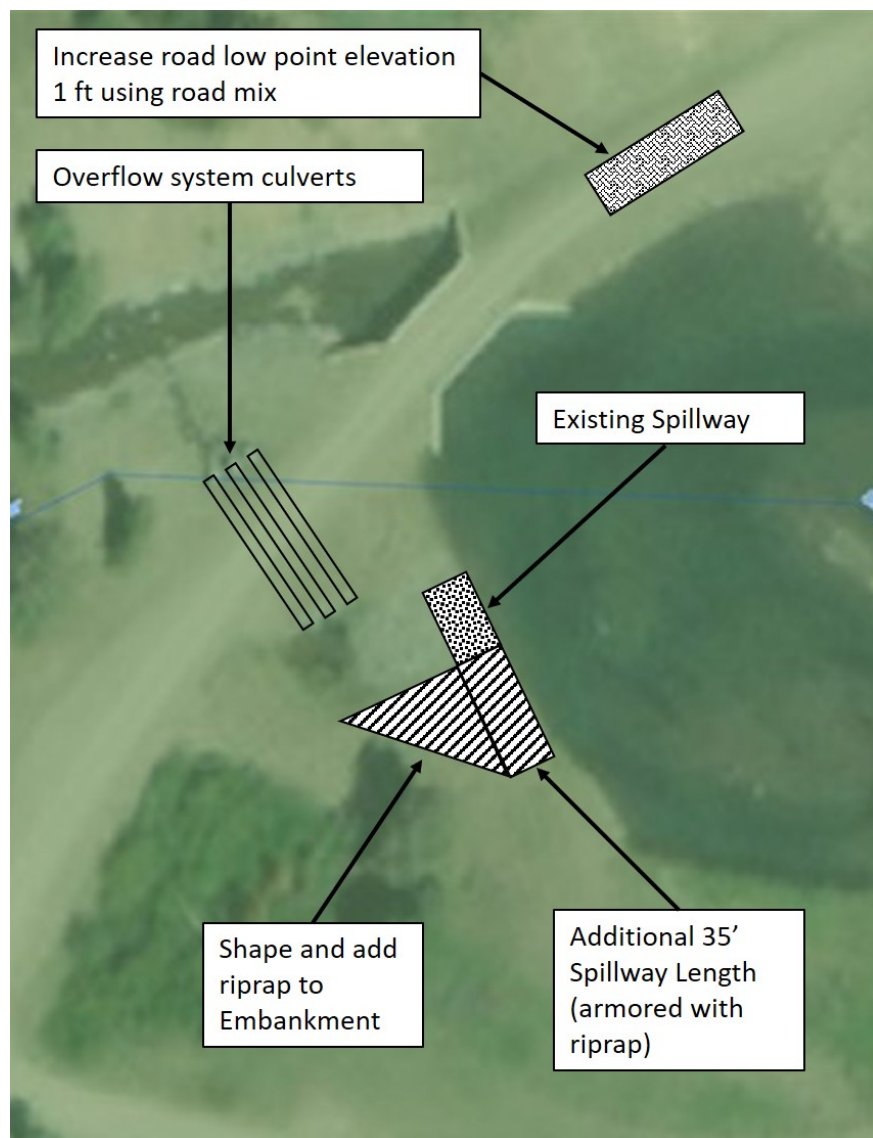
Proposed work at the Shields Bridge/Barrier Site
